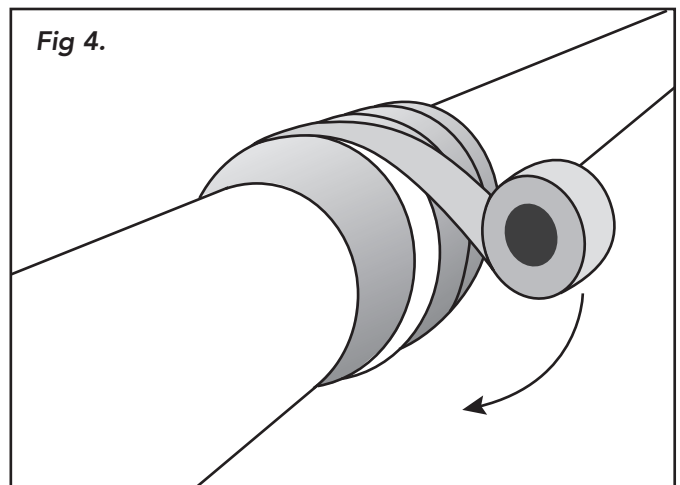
Spirally wrap the coupling or flange with Denso Hi-Tack Tape.
